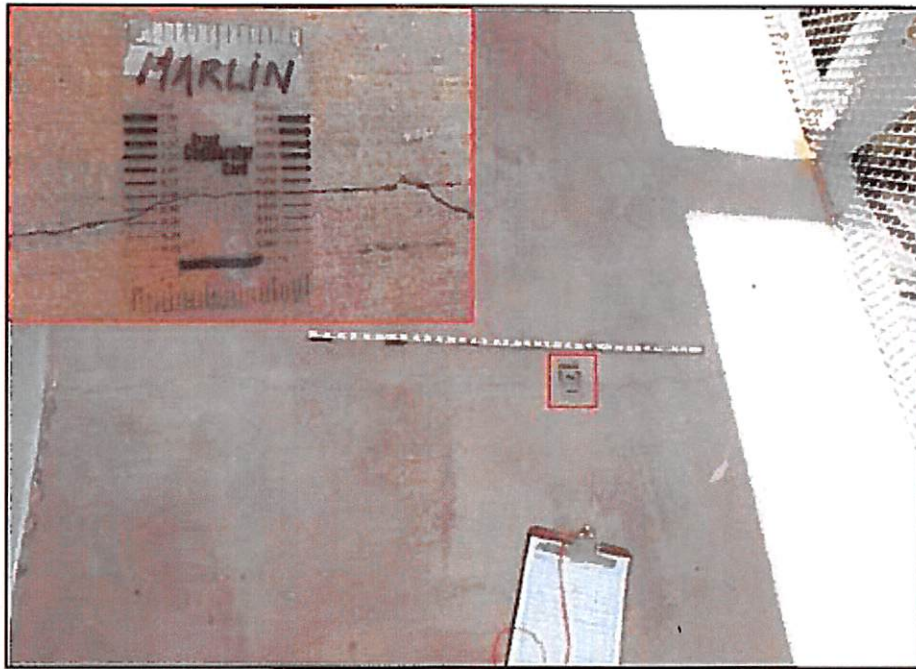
Typical full width transverse crack up to 1/32in. W on the deck top.
